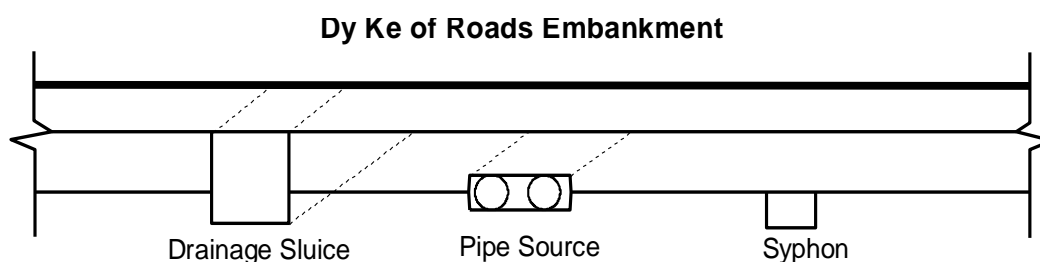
A schematic view of Drainage sluice, pipe sluice and siphon on embankment which relieve drainage congestion.
